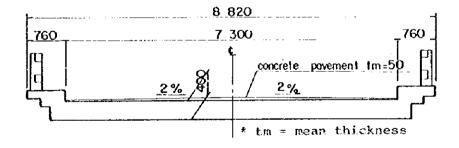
TYPICAL RC SLAB BRIDGE
